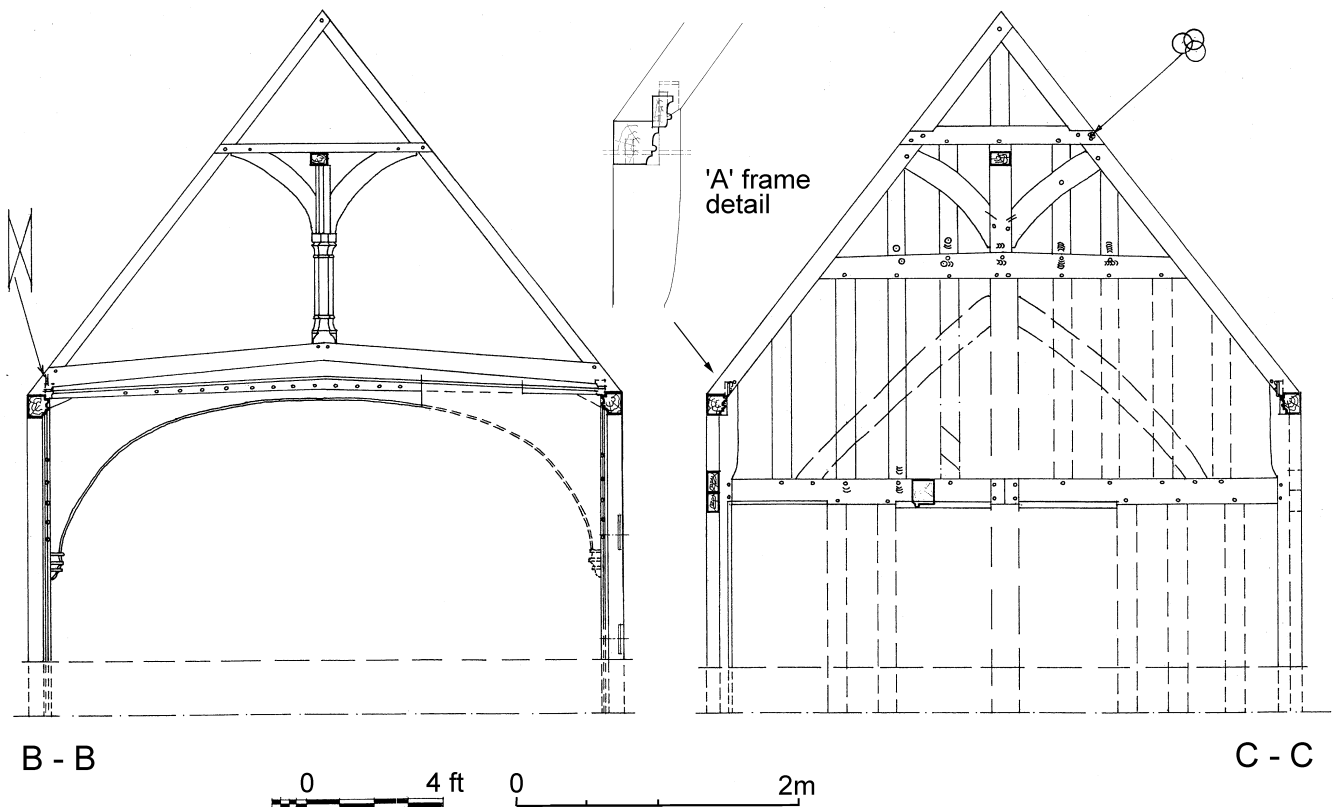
Fobbing, Copeland House, truss over the open hall (left) and A-frame partition wall between hall and service end, with detail of joint between rafter, storey post and wall plate.
